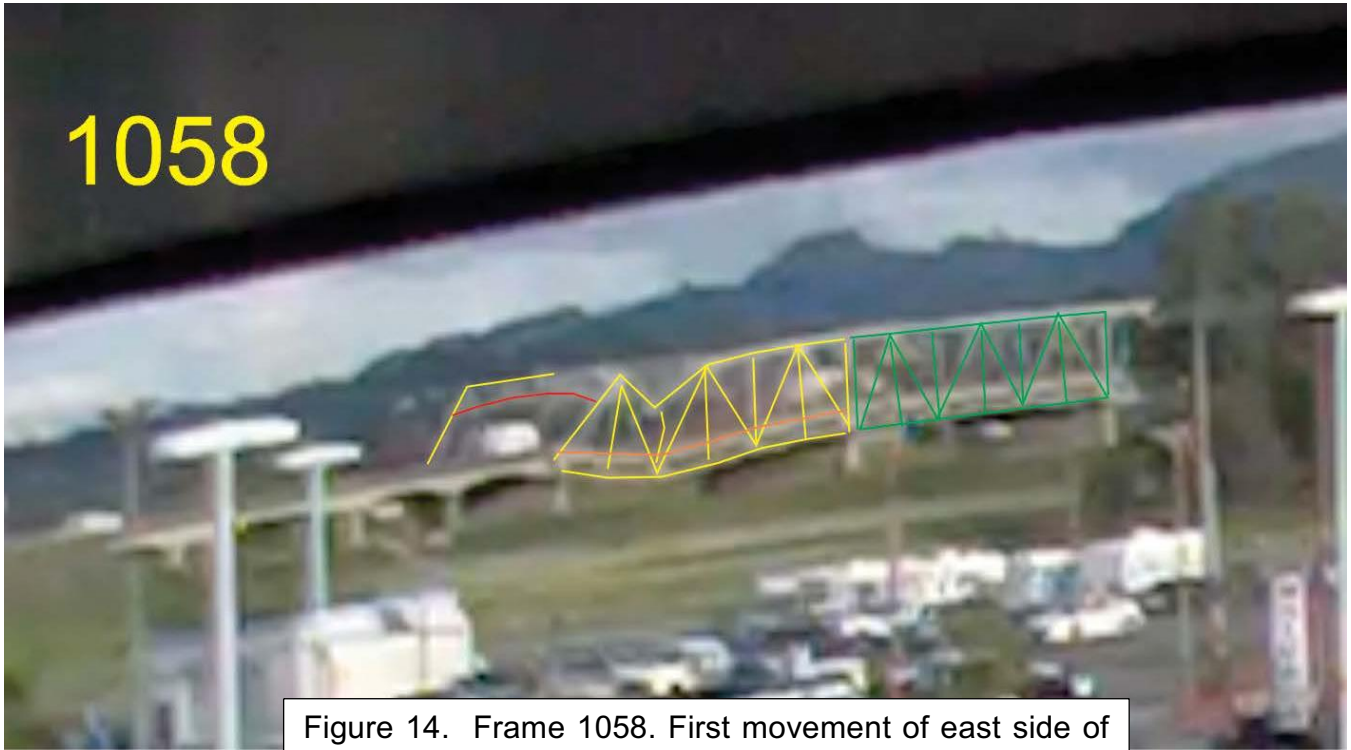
Frame 1058. First movement of east side of portal. Load approaches Span 7 U4W.
